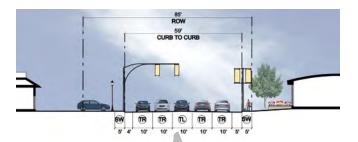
St. Ferdinand Street, Existing
